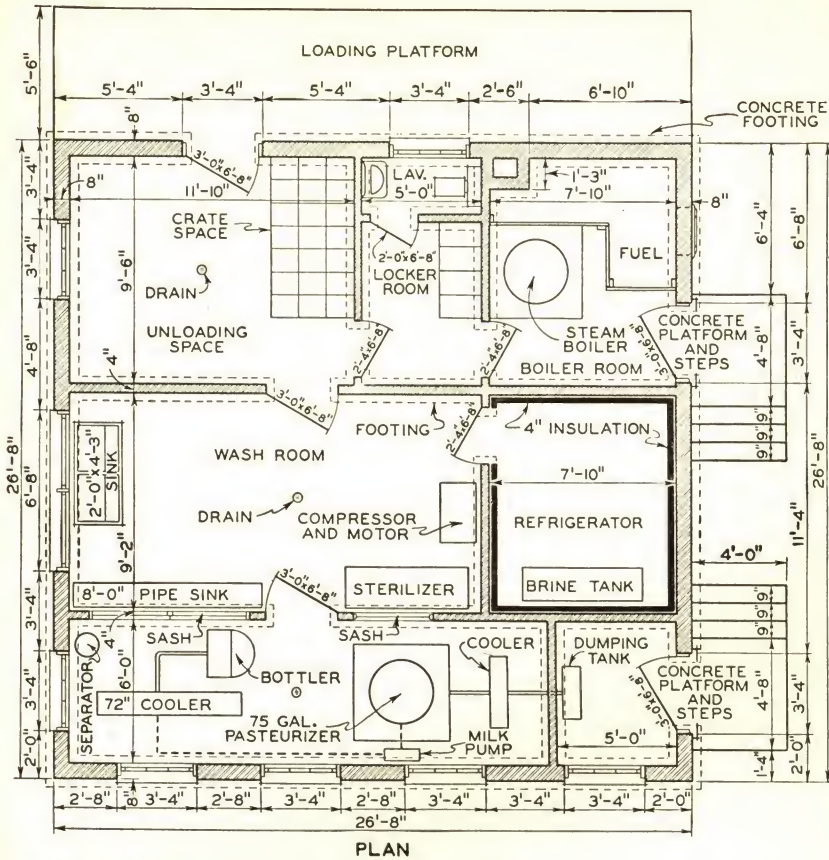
Plan View Working Drawings of the Milkhouse Shown in Figs. 2 and 5
